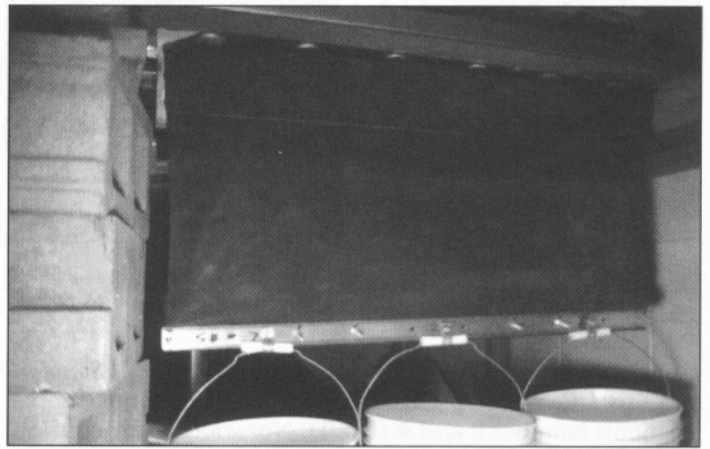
Perimeter securement creep rupture testing in progress. Pails with weight are affixed to the hanging EPDM membrane in the roof plane.
